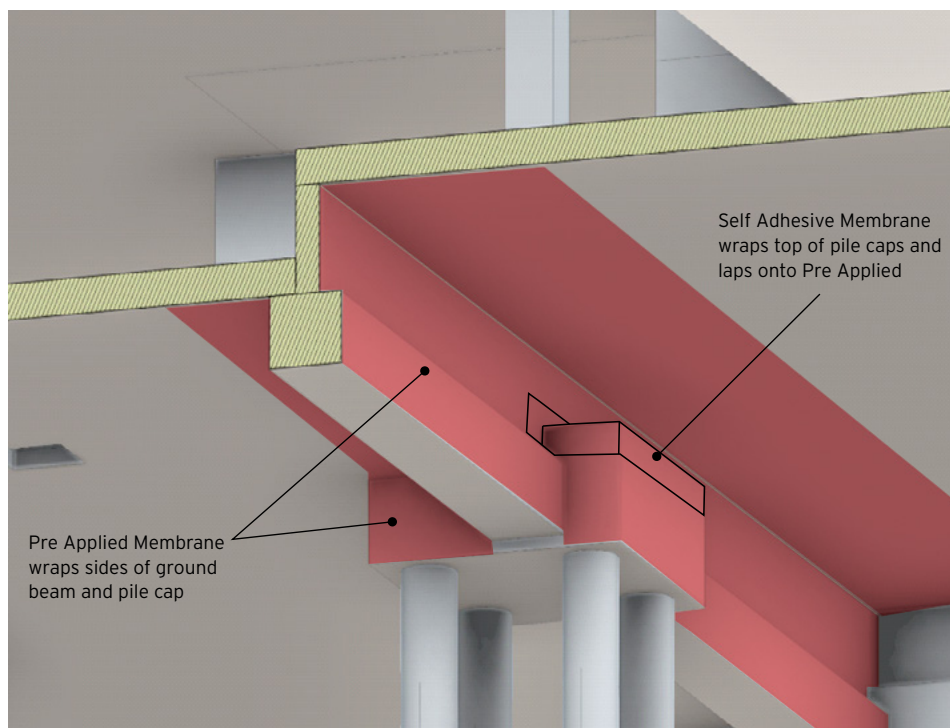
Example of 3D isometric drawing used to plan gas protection system
